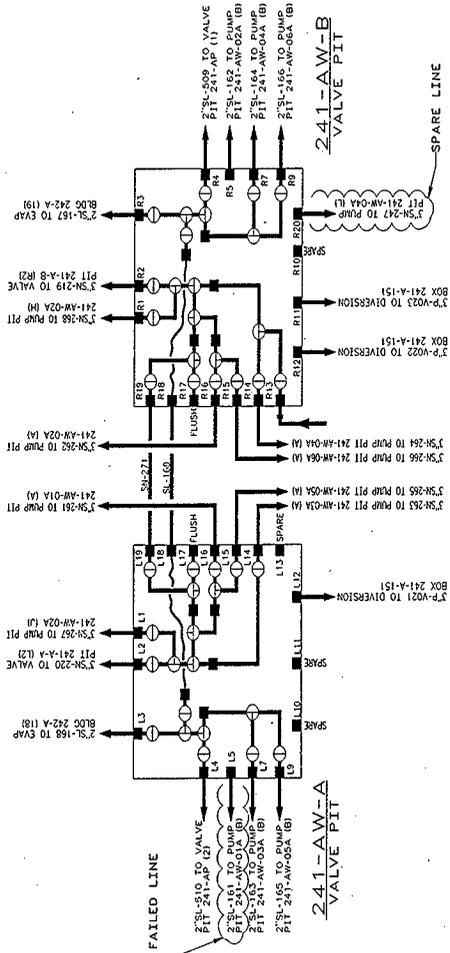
Tank 241-AW-102 Central Pump Pit Jumper Layout Sketch.
